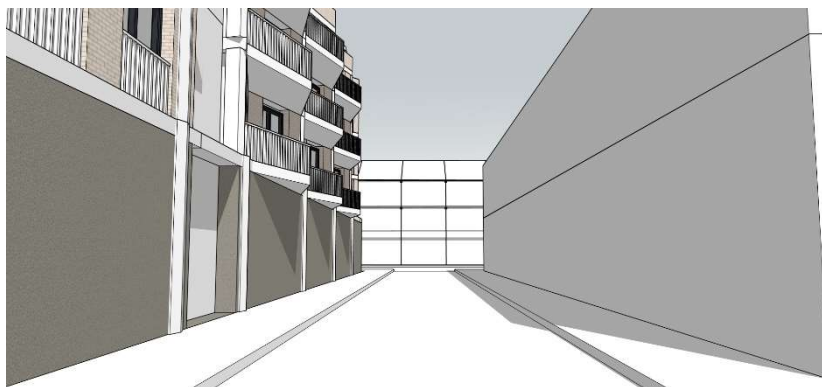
Haddington Road looking north – Testing better activating this street elevation, further work to test the well-detailed ground floor communal entrance on Haddington Street.
